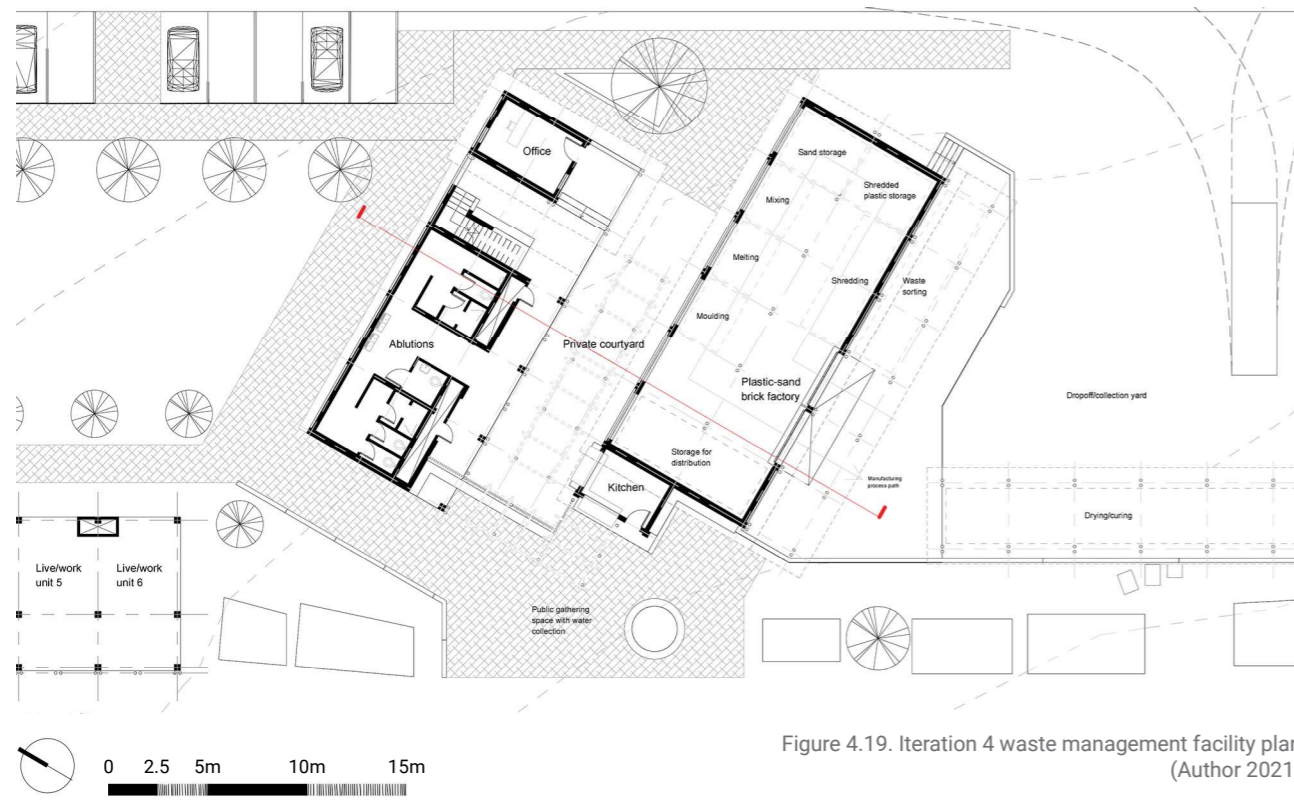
Iteration 4 waste management facility plan (Author 2021)
